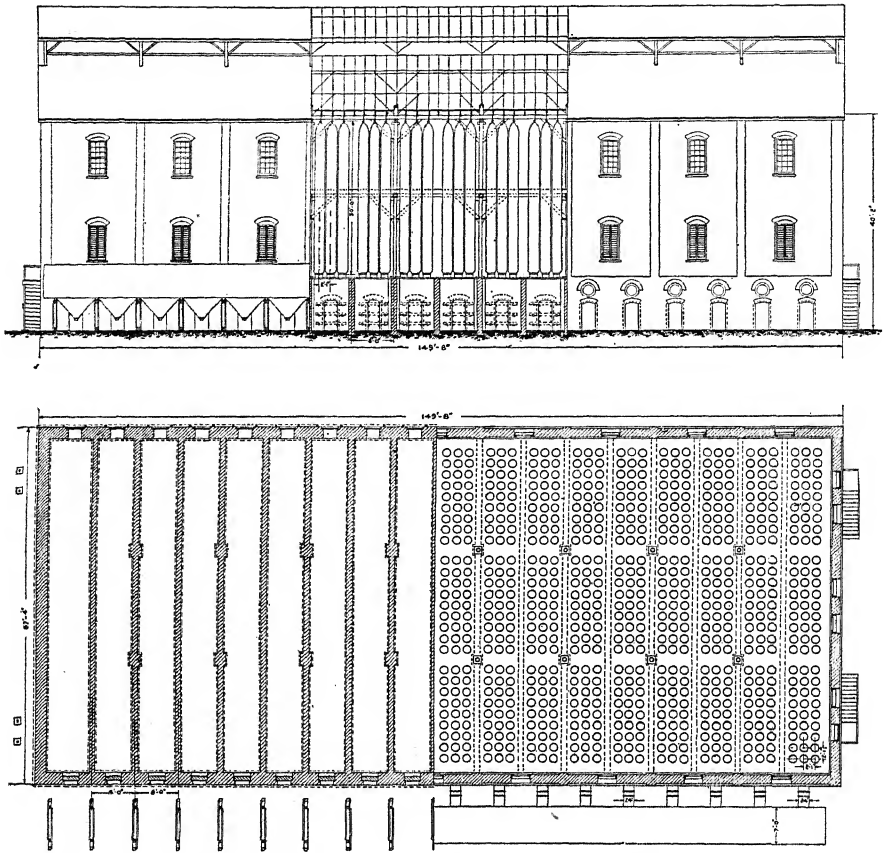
ELEVATION AND PLAN OF BAG HOUSE OF GLOBE SMELTING & REFINING CO., DENVER, COLO.
